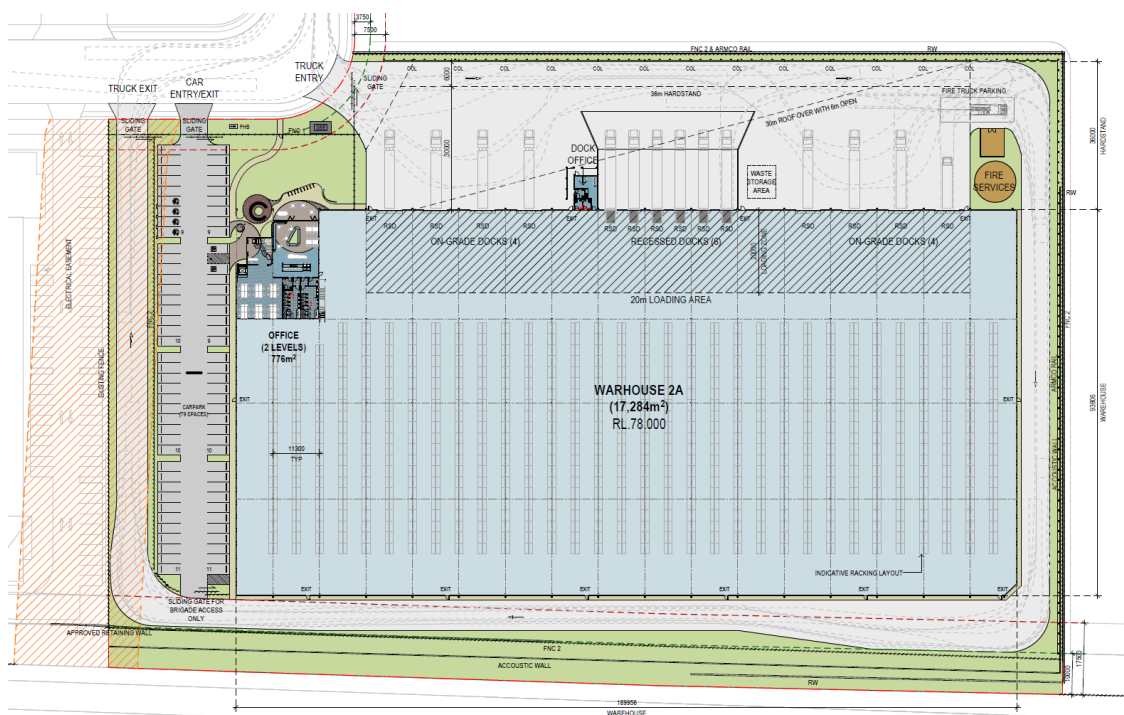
Proposed Building 2A site plan (Source: Goodman)
